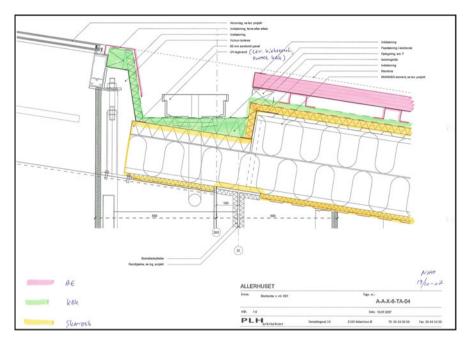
Detail architectural plan of roof construction *after* it has been *coloured* with *highlighters* for coordinative purposes (The image is courtesy of PLH Architects A/S. Reproduced with permission)
